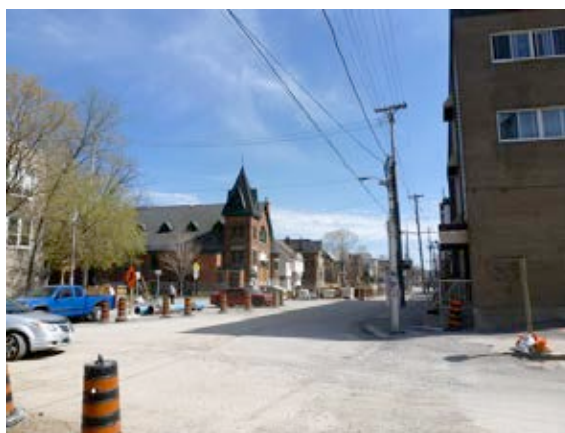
Bronson Ave at Primrose Ave, looking south towards McPhail Memorial Baptist Church at 249 Bronson Avenue.
